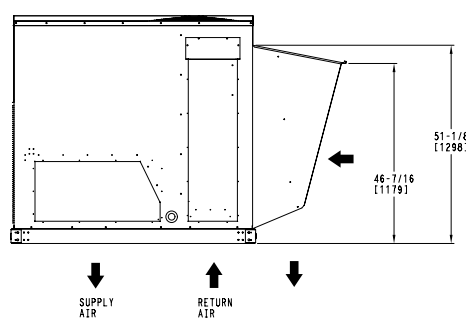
Unit Dimensional Drawing – 15 Ton, RAS180
